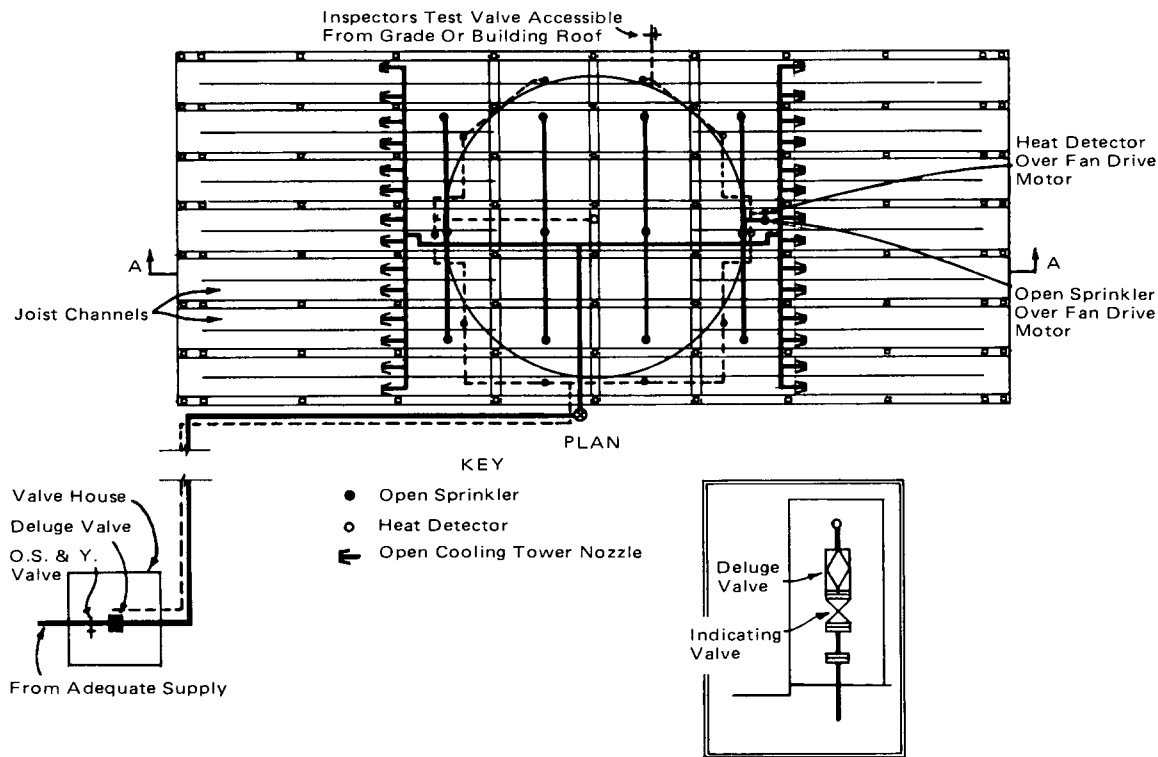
(a) Typical deluge fire protection arrangement for crossflow towers.
